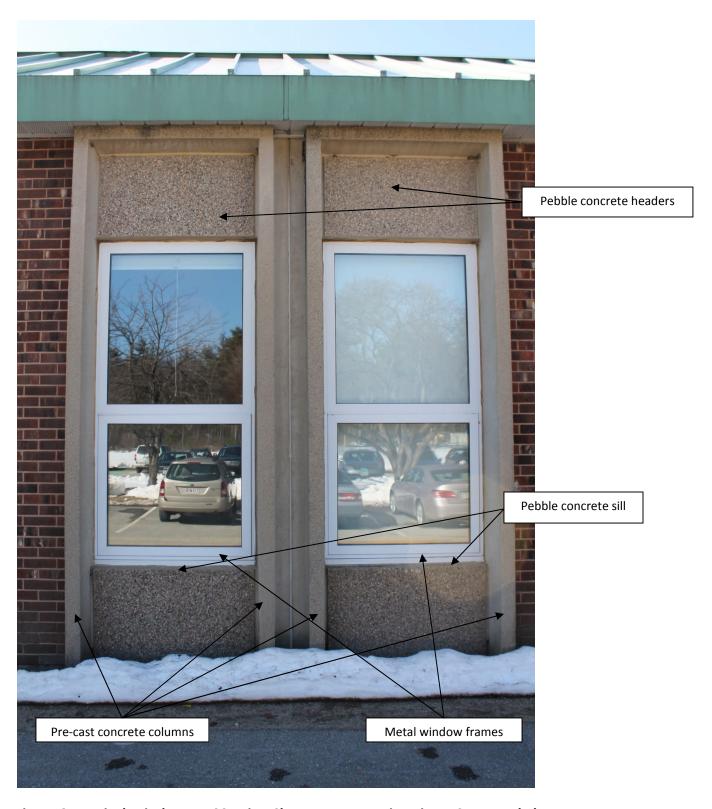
Typical Windows: 100-Wing Classrooms, Exterior View: Structural Elements.
